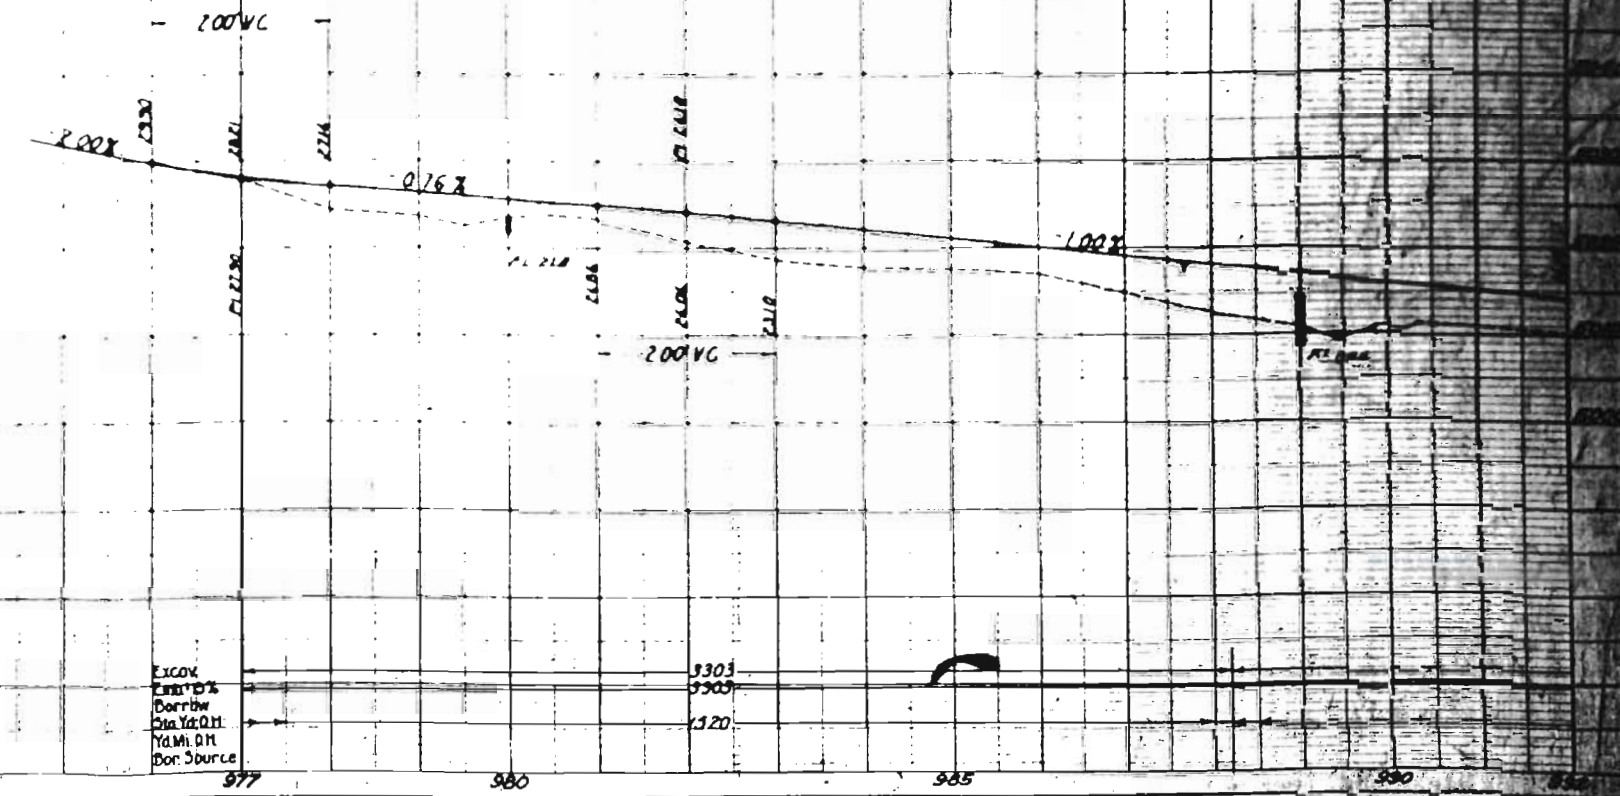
PLATE - PLAN PROFILE - 1/2" = 1' HORIZONTAL
